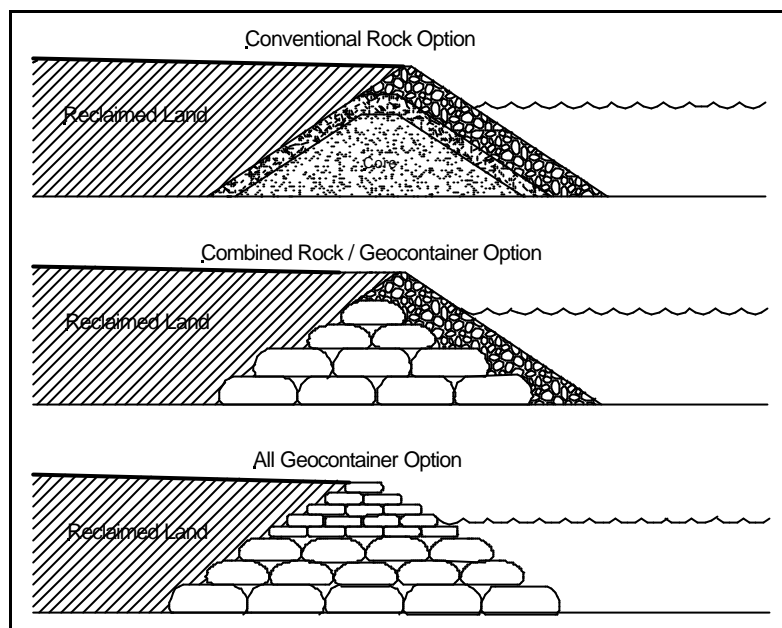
Typical reclamation profiles for rock and sand filled geotextile containers.
